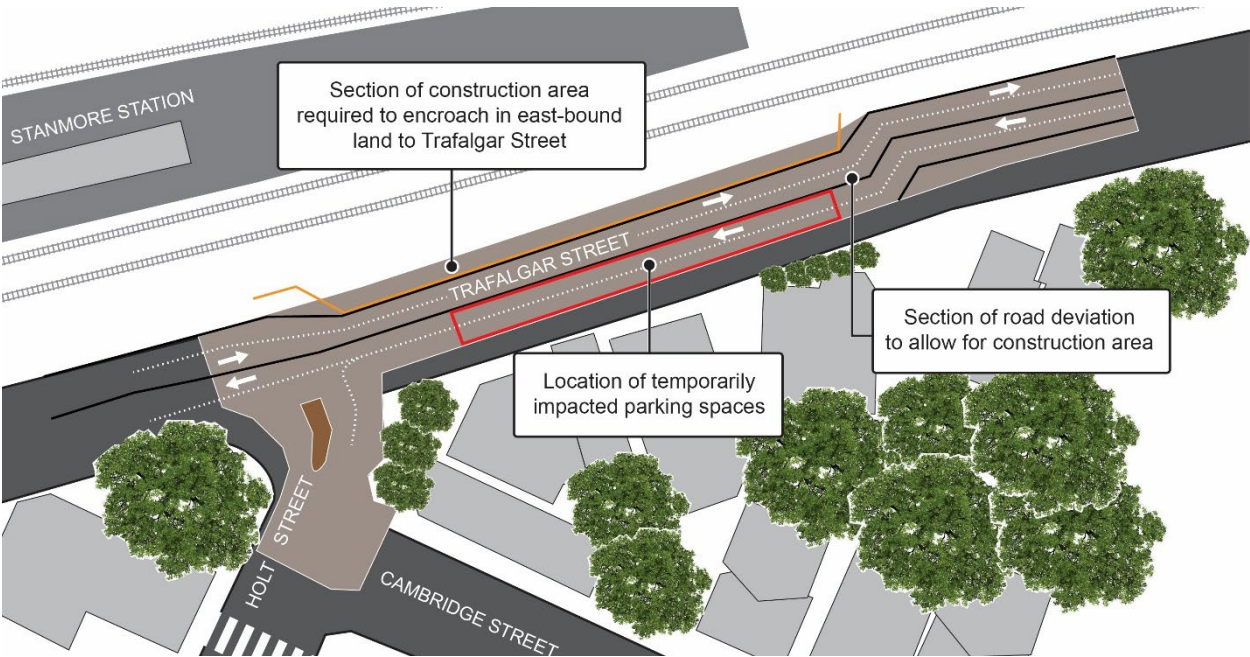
Location of the proposed temporary removal of on street parking along Trafalgar Street during construction
